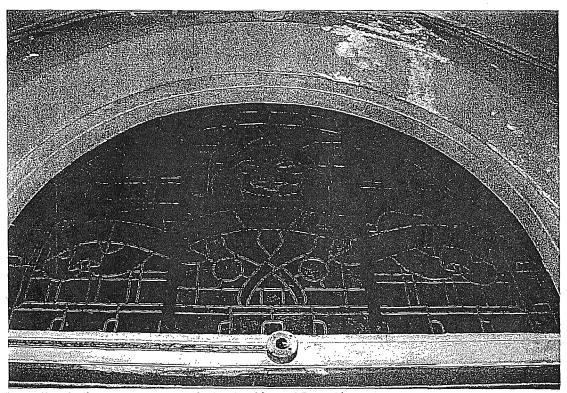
North-east transept portal, showing blocked figurative stained glass window with heavy soiling and corrosion of steel frame
